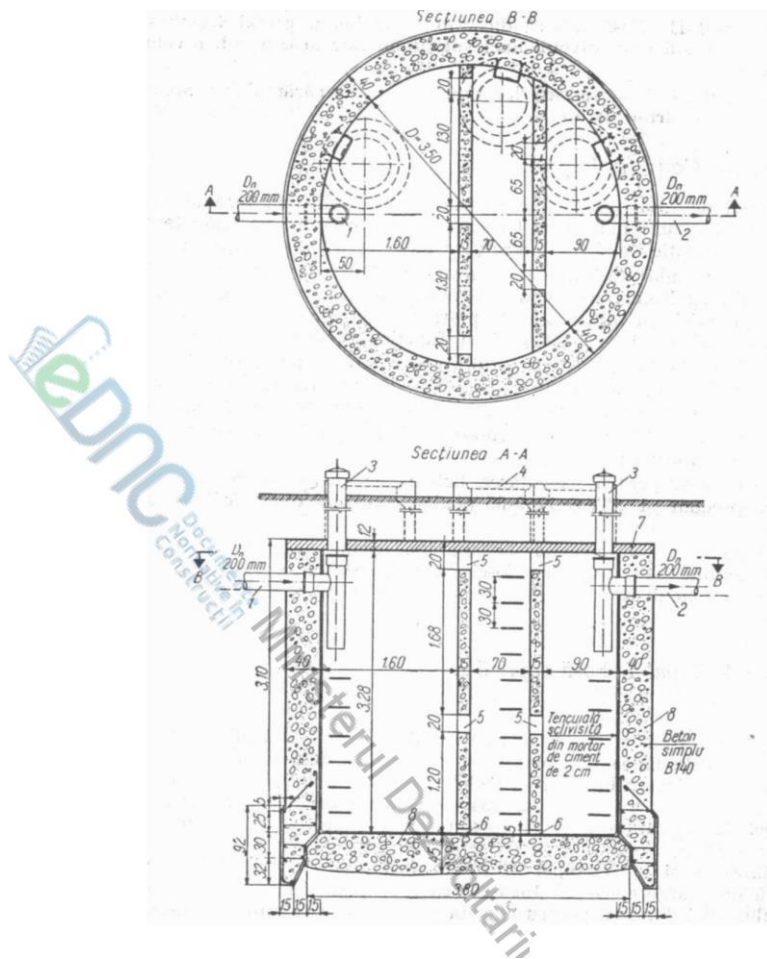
Circular caisson septic tank of reinforced concrete: 1 – inlet, cast iron drain pipe; 2 – outlet, cast iron drain pipe; 3 – cleaning basket; 4 – reinforced concrete or cast iron tap; 5 – passage holes 20 x 20 cm; 6 – holes 15 x 5 cm; 7 – reinforced concrete B140; 8 – simple concrete B140
